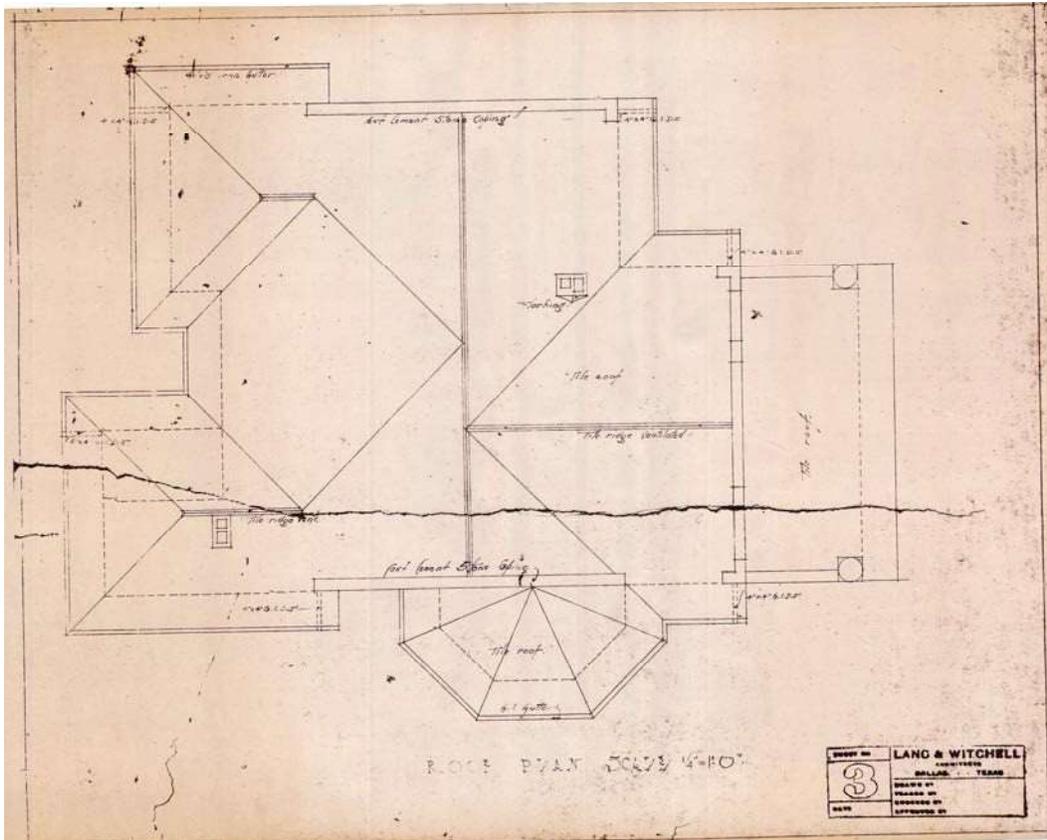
Original Lang and Witchell Roof Plan – Sheet 3
